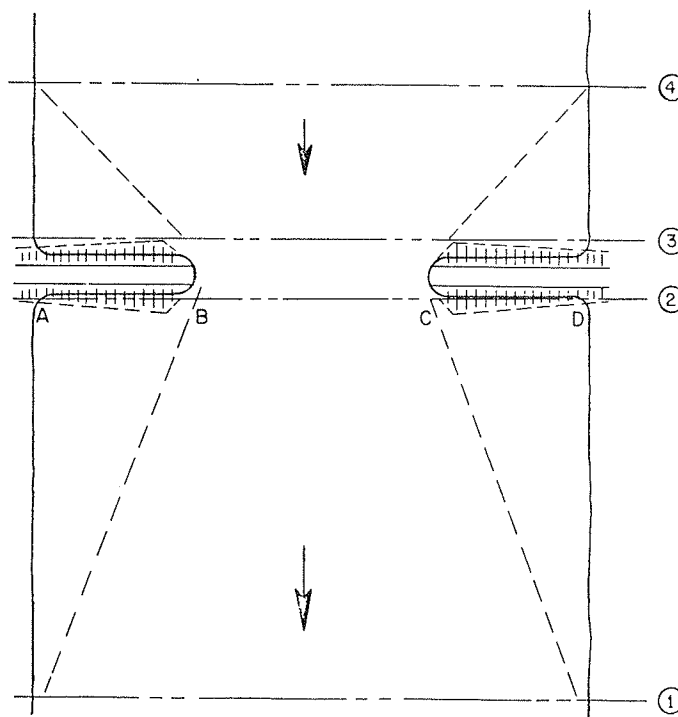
Locations of cross sections in the vicinity of bridges.
